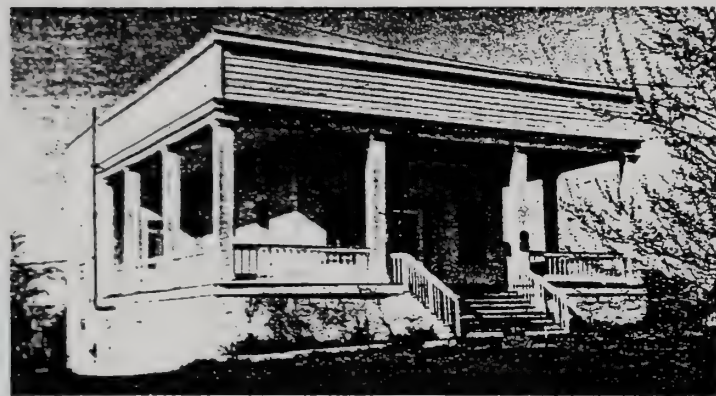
Sebastopol House, Seguin, Texas (1856). This Greek Revival dwelling is one of the few remaining poured-in-place concrete structures in this Texas town noted for its construction of over 90 concrete buildings in the mid-nineteenth century. The high parapets surrounding the flat roof were lined and served as a water reservoir to cool the house. Photo: Texas Historical Commission.
